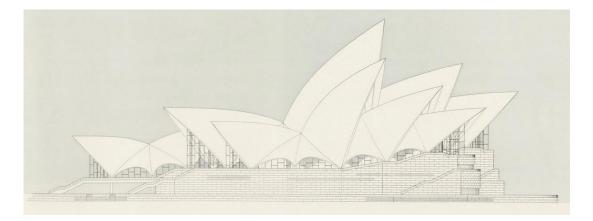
Elevation Drawing of Sydney Opera House⁶⁴
